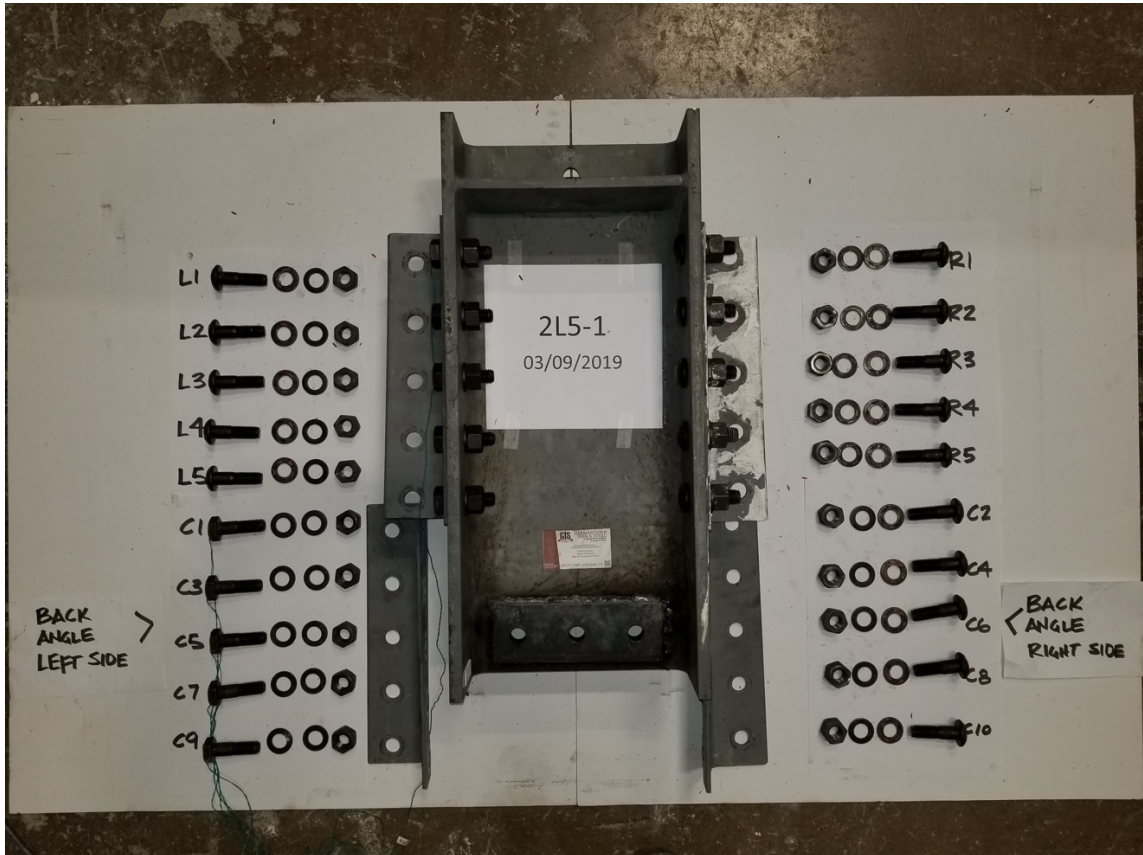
Typical post-test layout of 2L5 series specimen.
